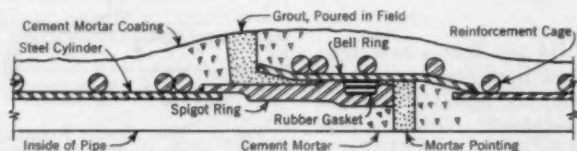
Pretensioned-Concrete Cylinder Pipe and Joint
